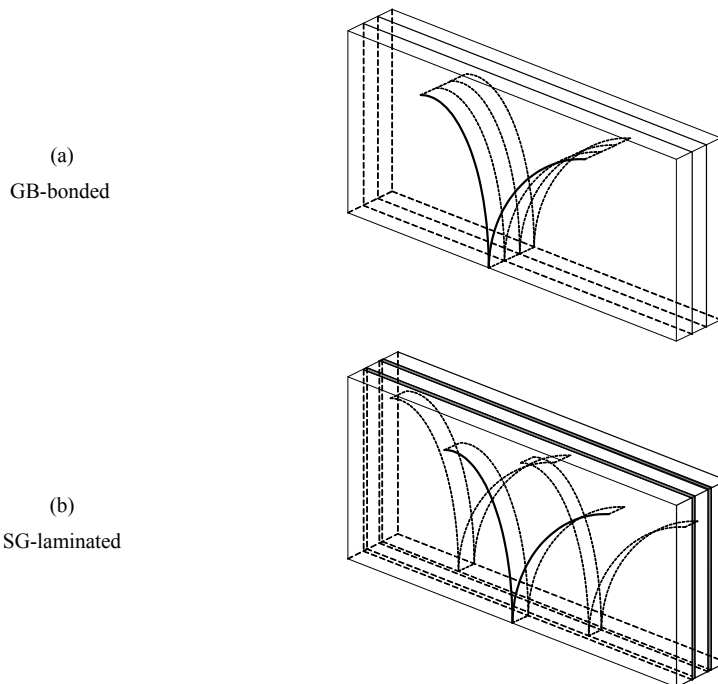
Cracking behaviour of GB-bonded and SG-laminated beams; (a) GB-bonded beams. The cracks generally run through the full width of the laminate; (b) SG-laminated beams. The crack runs in only one layer, due to the crack blocking properties of the SG interlayer.
